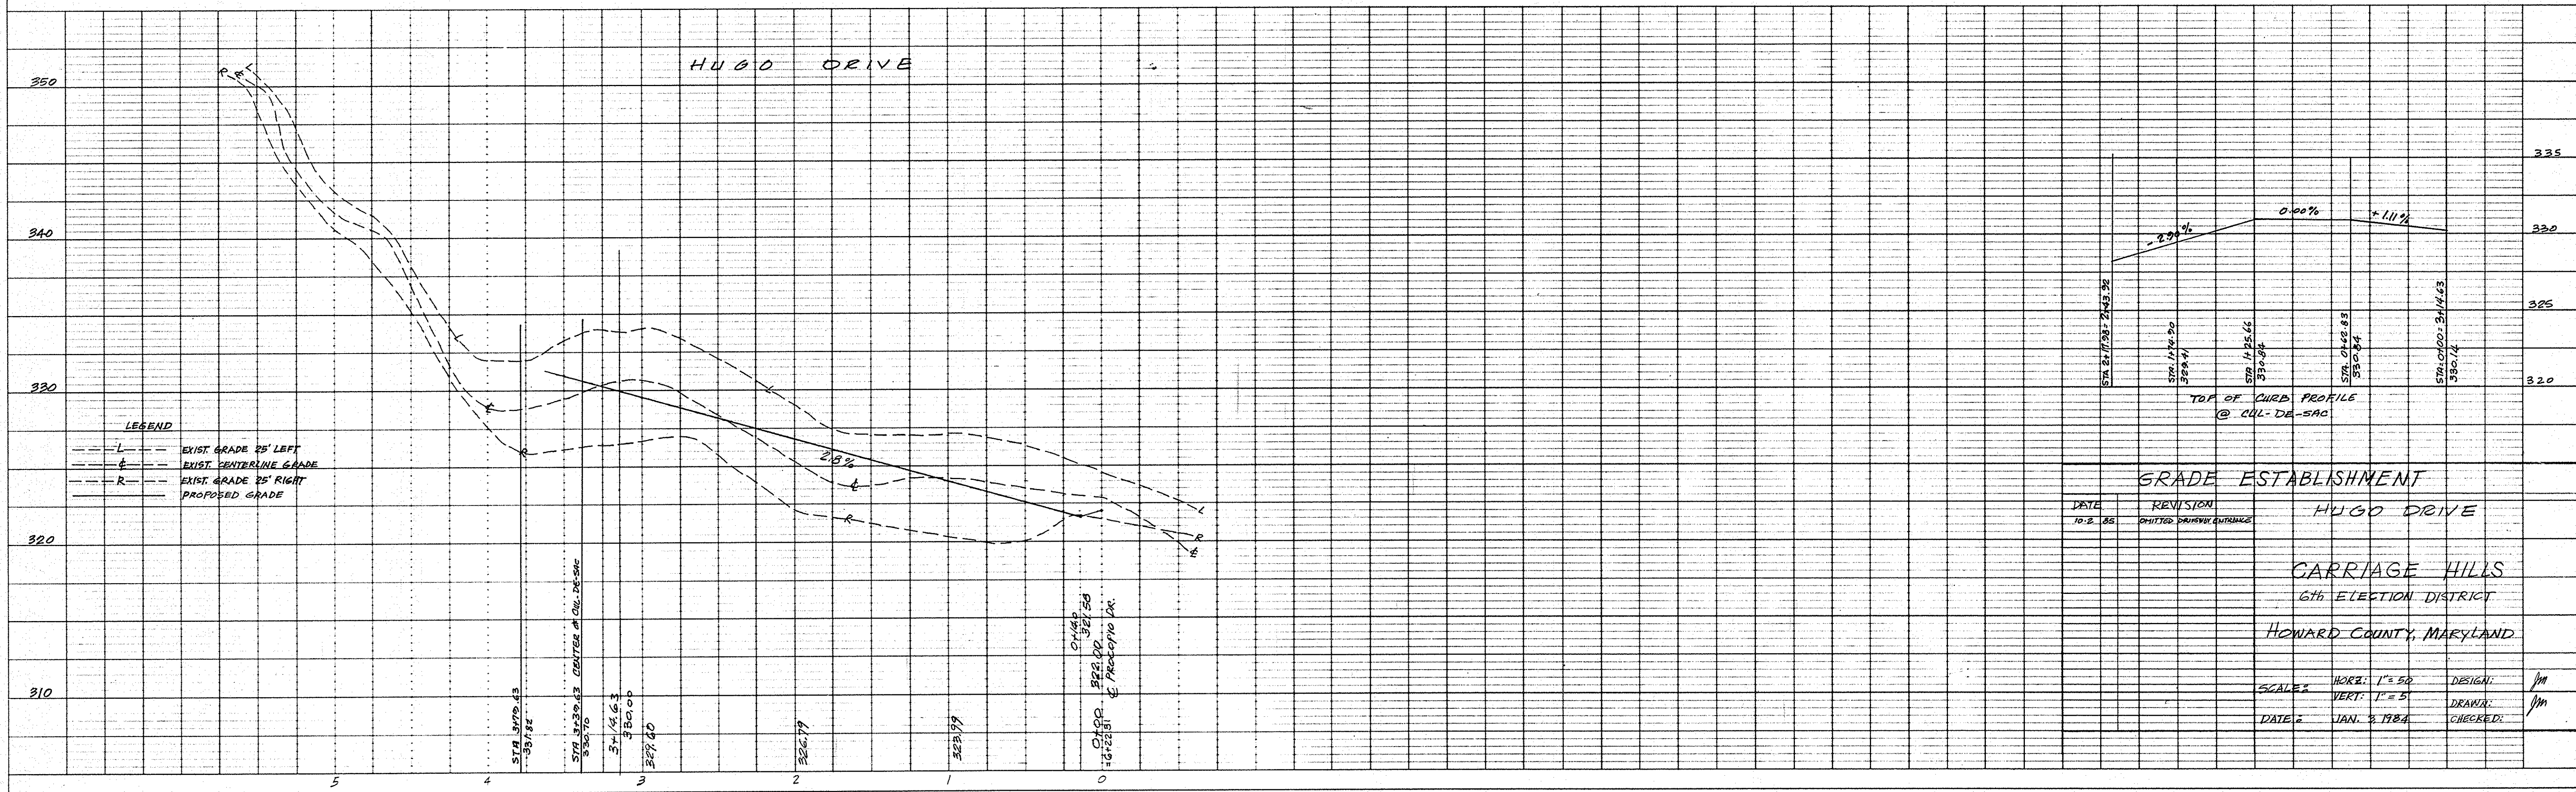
SINGLE PLAN AND PROFILE-FULL LINE
